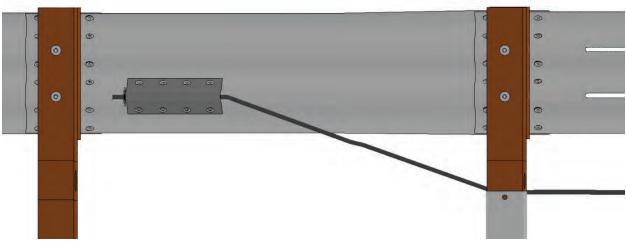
Back View of Tension Cable (Sand Hidden).
